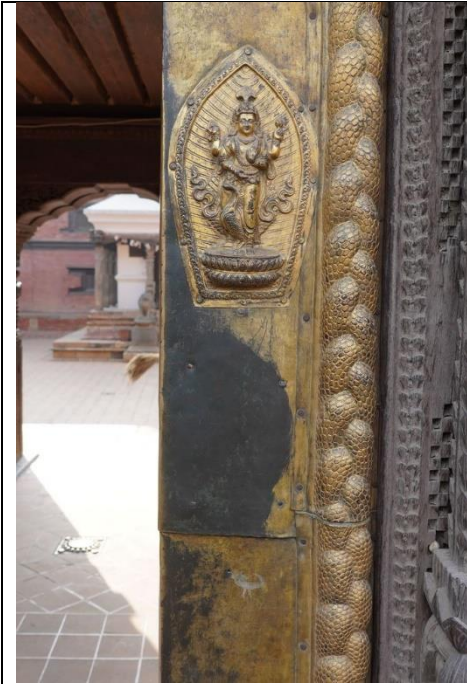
Abrasion/Worn out Gilding on the right door frame
